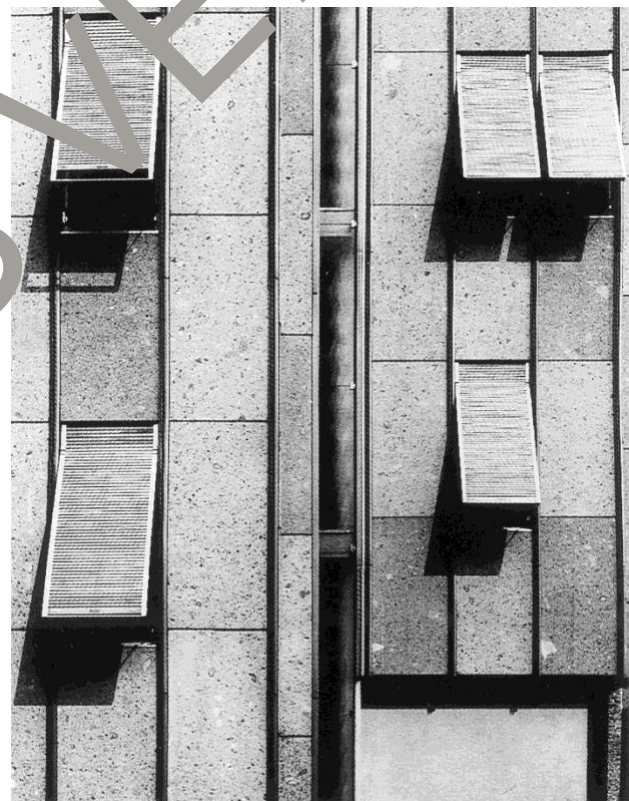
FEAL Houses detail facade. Source: Fondo Marco Zanuso, *Archivio del Moderno*, Balerna
